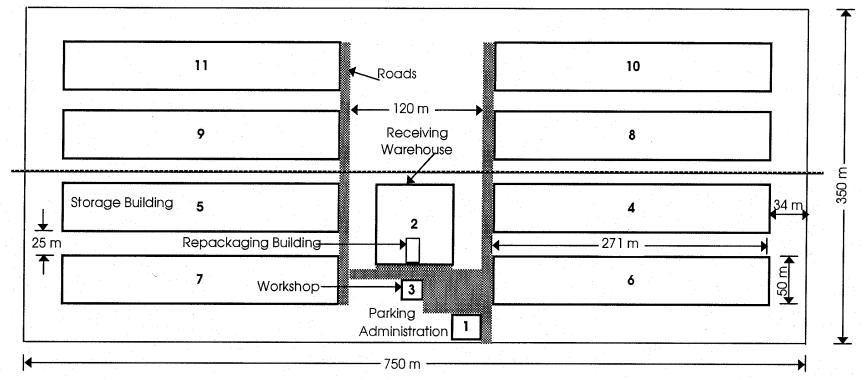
Site Layout of the Building Storage Facility — Uranium Metal, Base (100%) Case
